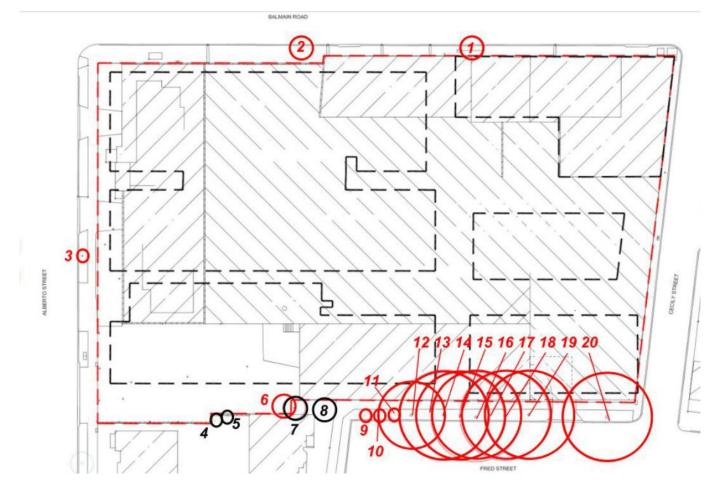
below illustrates the tree retention and removal plan under the AIA at Appendix Z.
